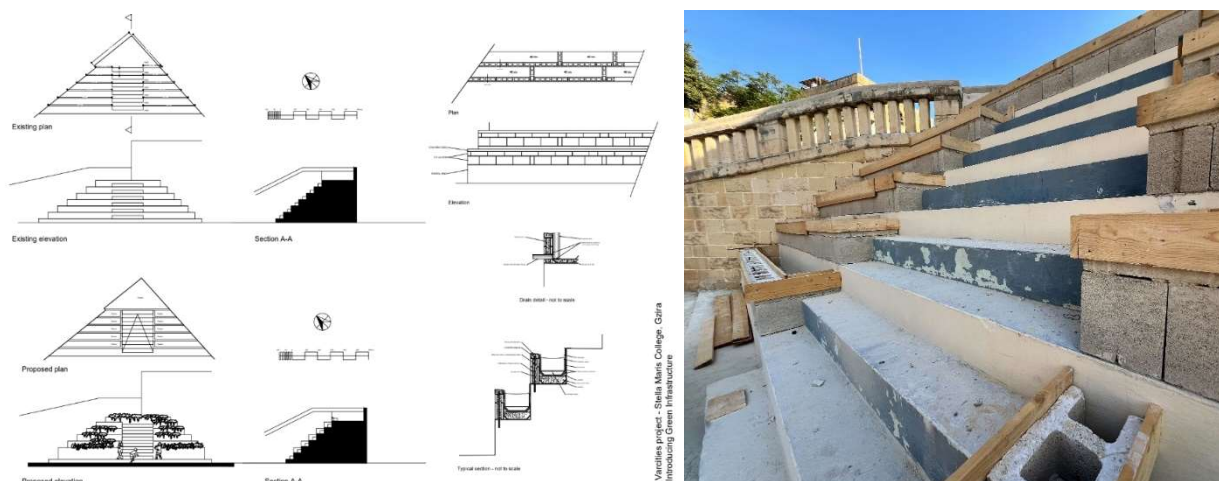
Gzira (MT) Proposed plan and construction of the Stella Maris planters
